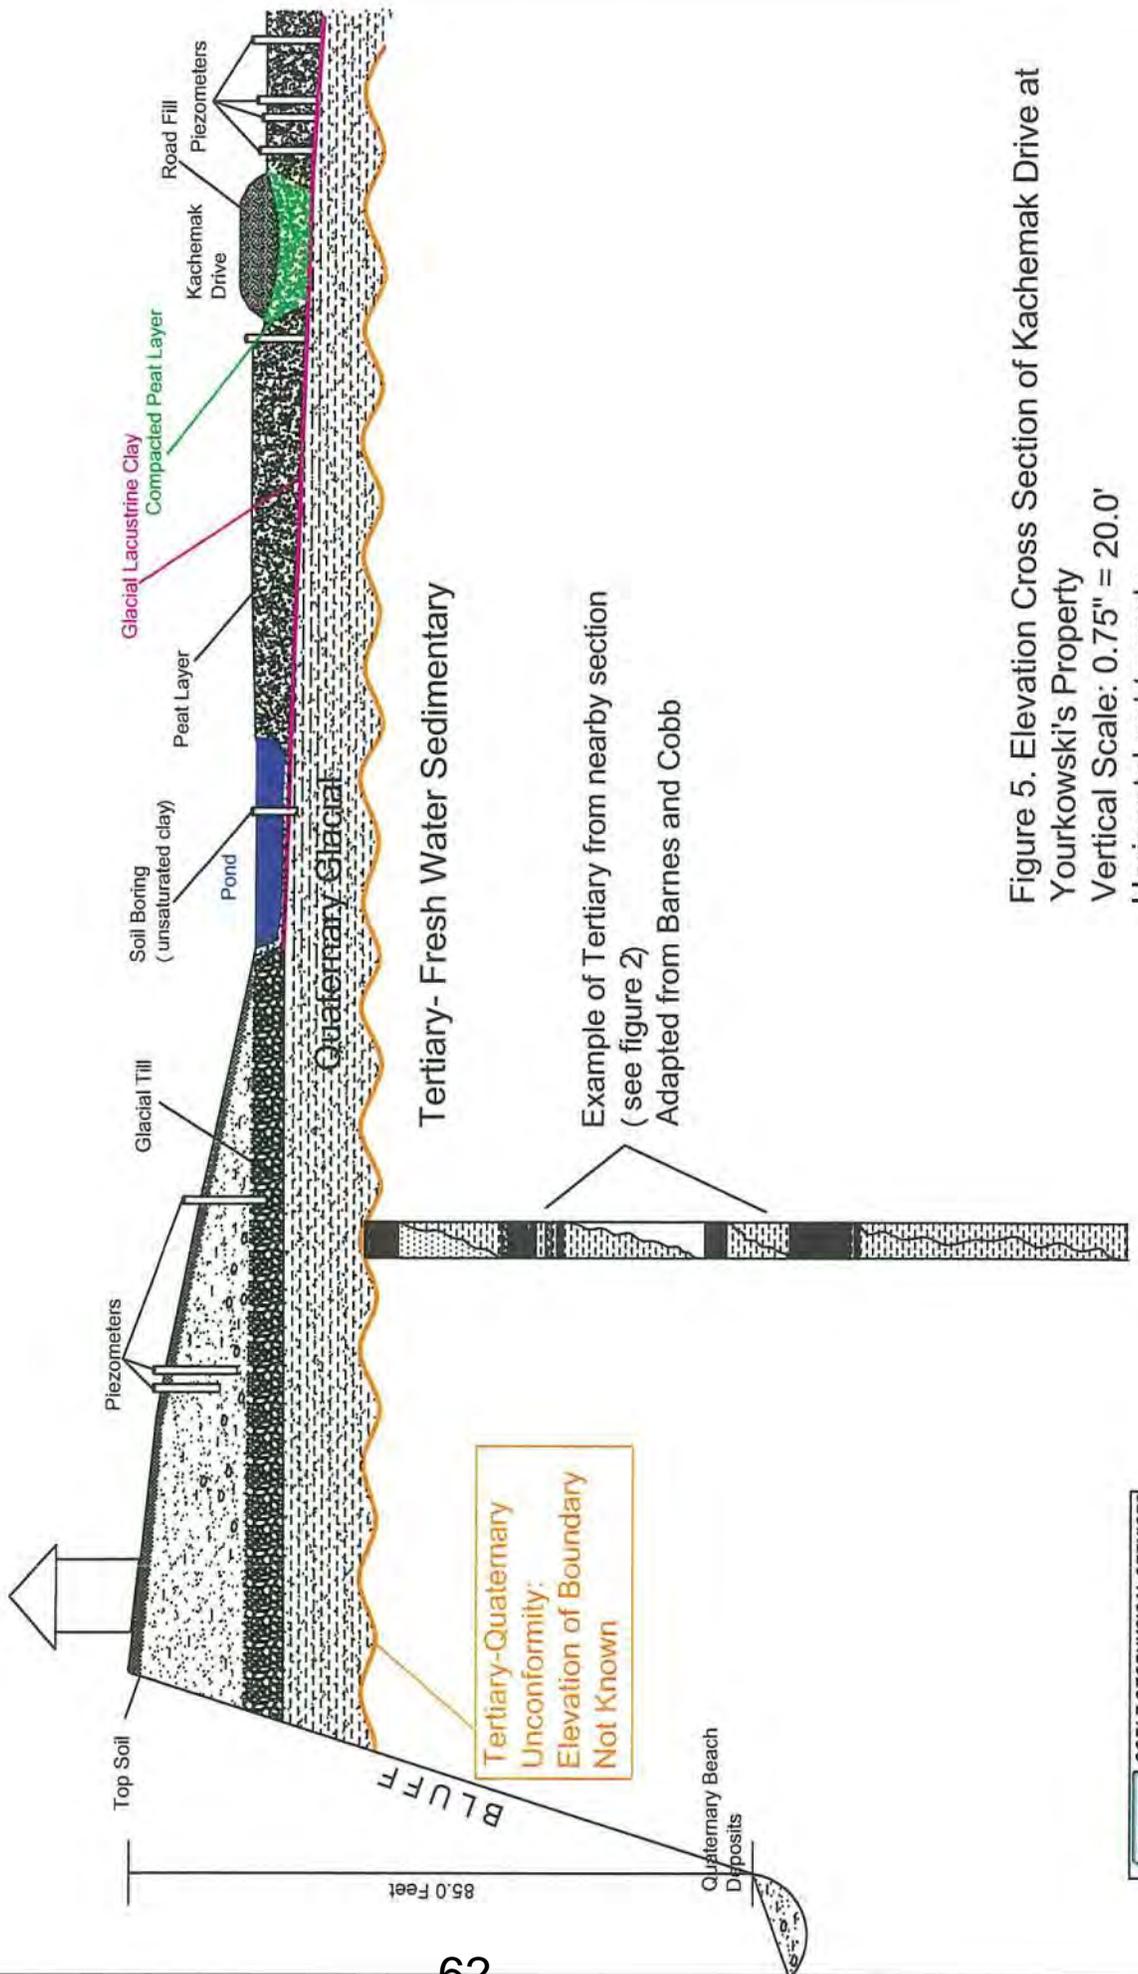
Elevation Cross Section of Kachemak Drive at Yourkowski's Property
